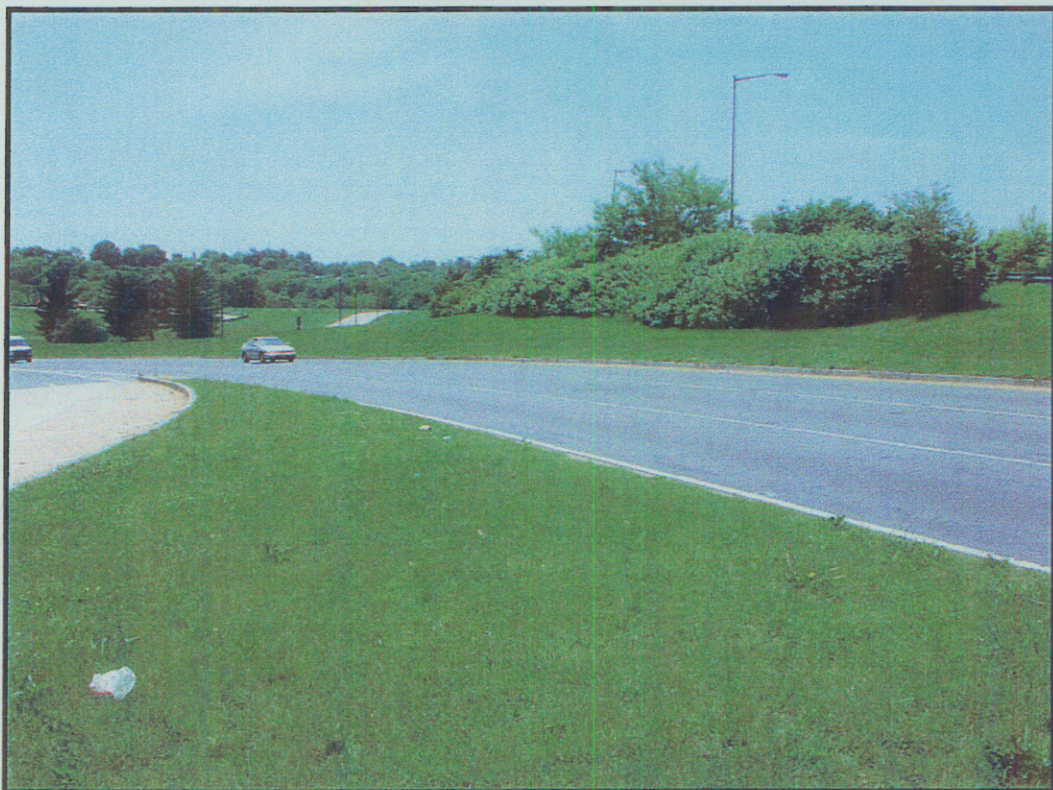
Overview of northern portions of 5861-942, 5861-943, 5861-944, and 5861-945, facing southwest. Note: Suitland Parkway on central portion of photograph.
